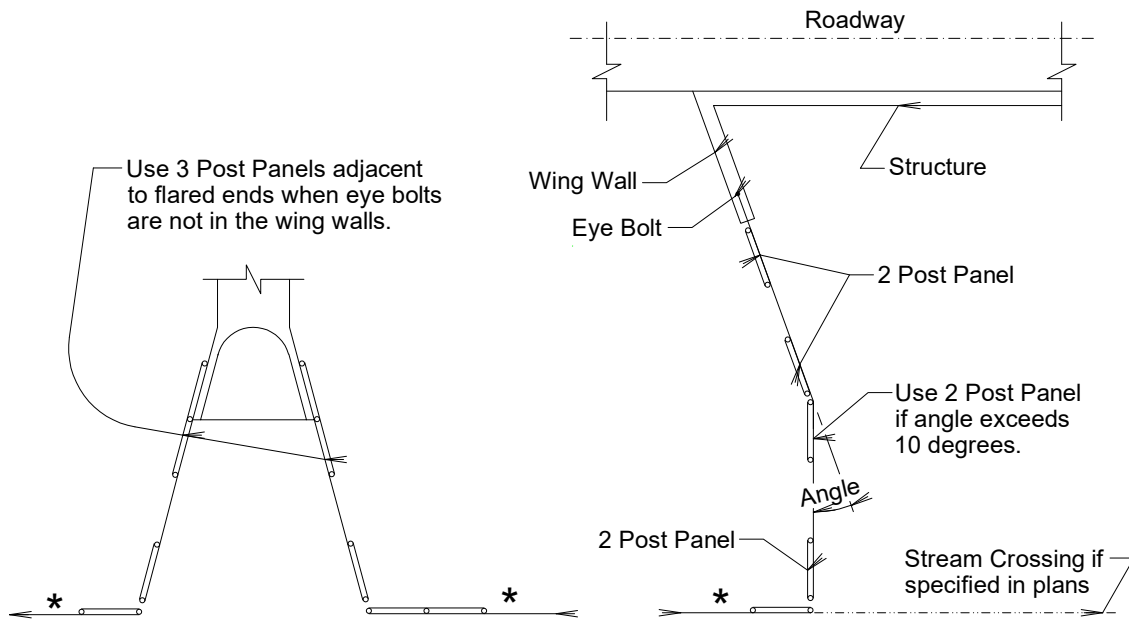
FENCING-BRACE PANEL APPLICATIONS AT STRUCTURES
